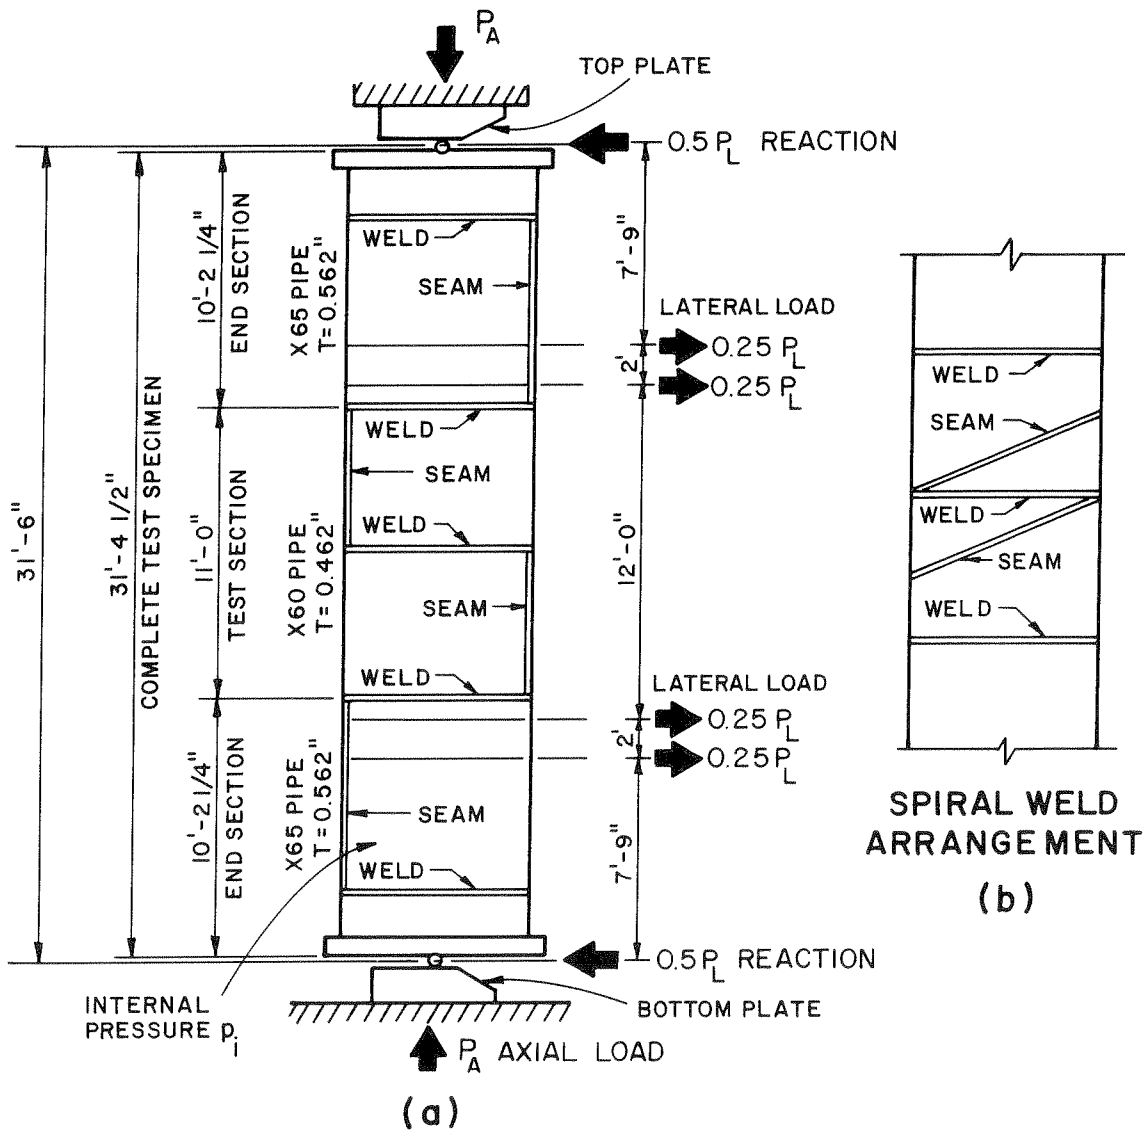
TYPICAL 48" PIPE TEST SPECIMEN
